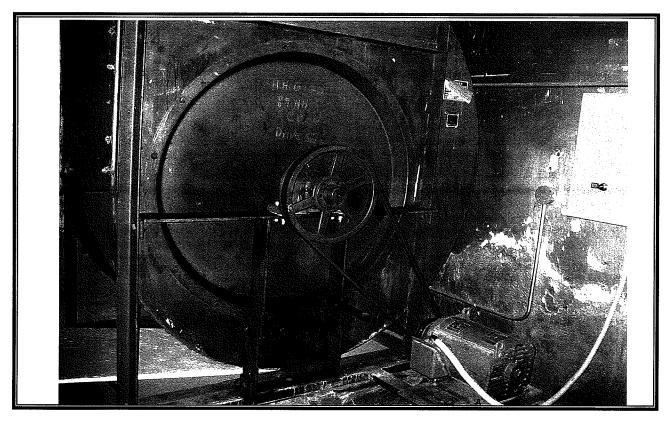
Photo Date 12/05/06 B. Forman Building40 + years old air handling unit AH1A located in the basement
